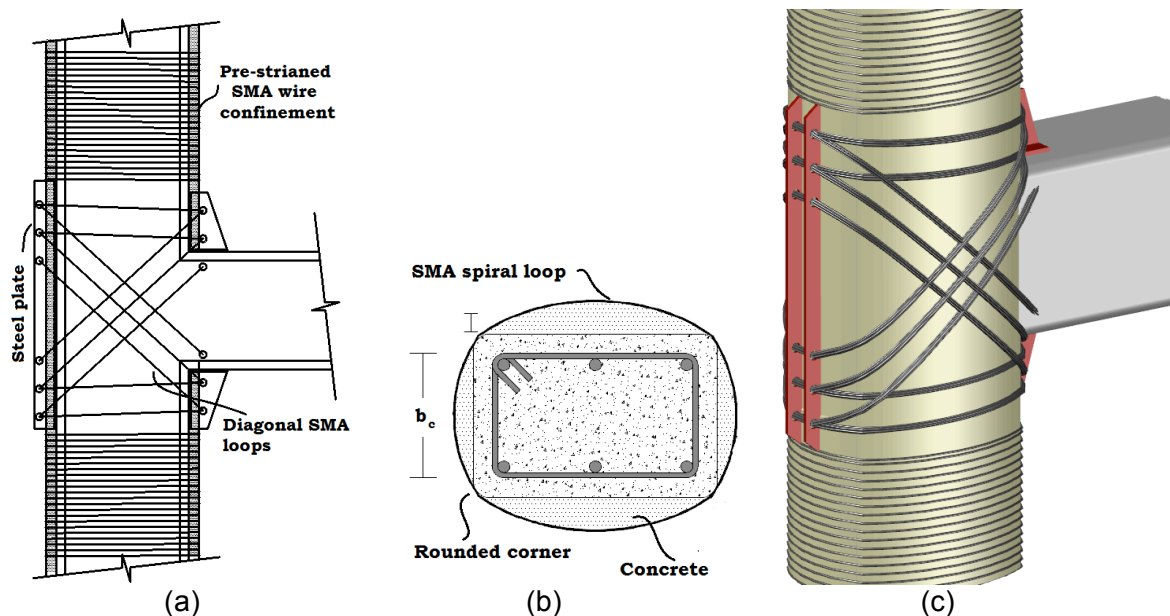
(a) Schematic of the proposed Scheme-2; (b) cross-section of the retrofitted column section; and (c) 3D enlarged view of the Scheme-2 showing modified cross-section, SMA winding and anchorage arrangement of SMA loops.
